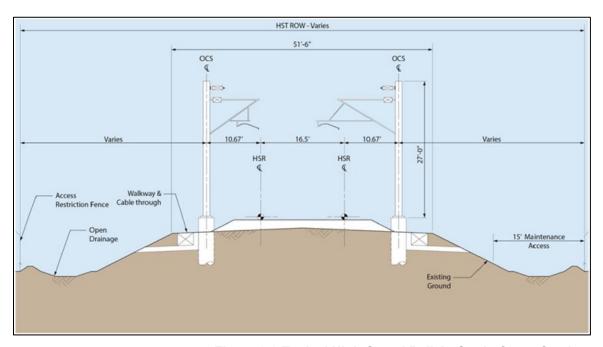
Typical High-Speed Rail At-Grade Cross Section
